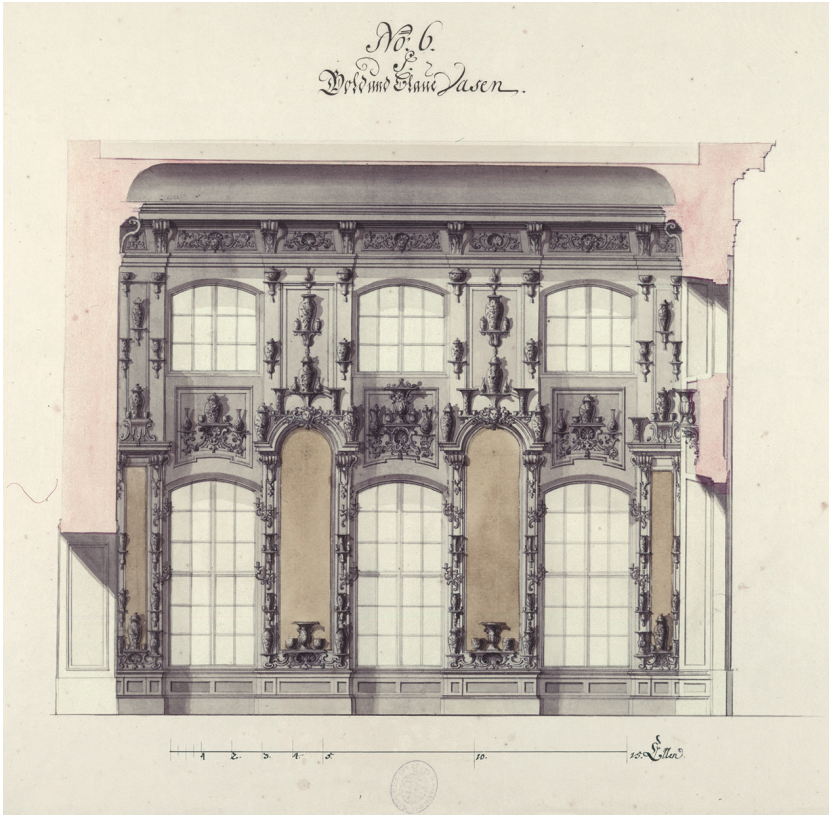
Japanese Palace, elevation of one wall of the corner room in the upper floor for vases in gold and blue, 1729.
